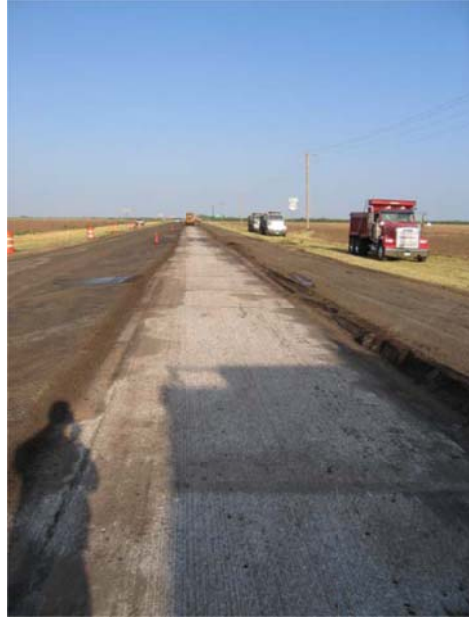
Existing concrete pavement exposed after removal of HMA layer.
